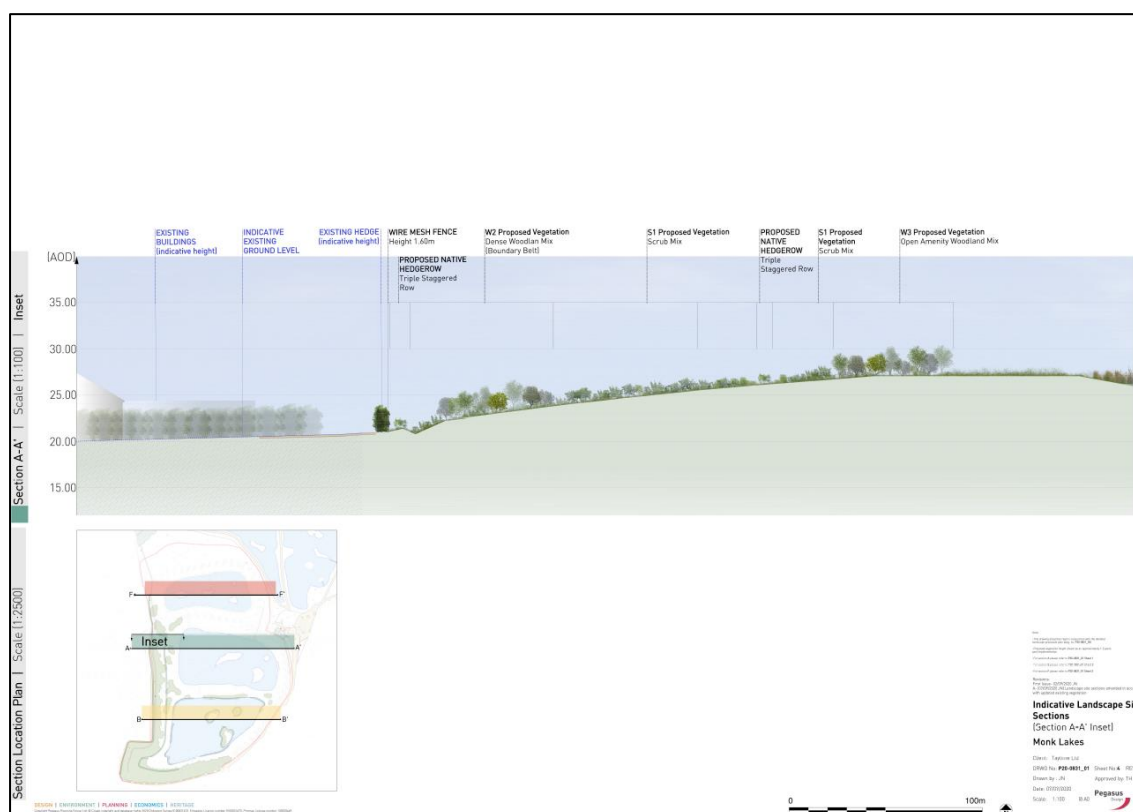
Sectional Drawing Section A-A Inset (ref. P20-0831_01 Sheet 4)
